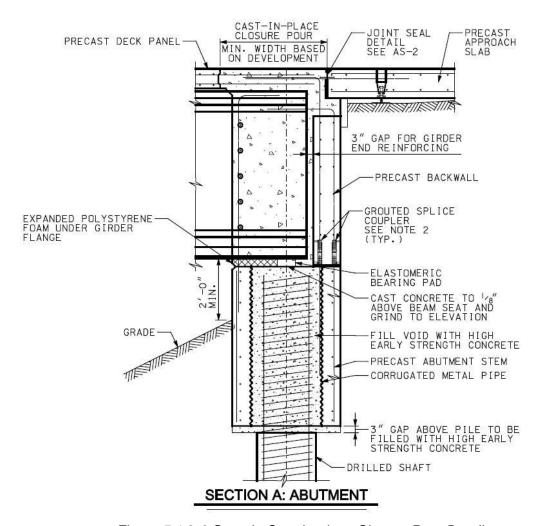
Sample Cast-in-place Closure Pour Detail (source: Utah DOT)
